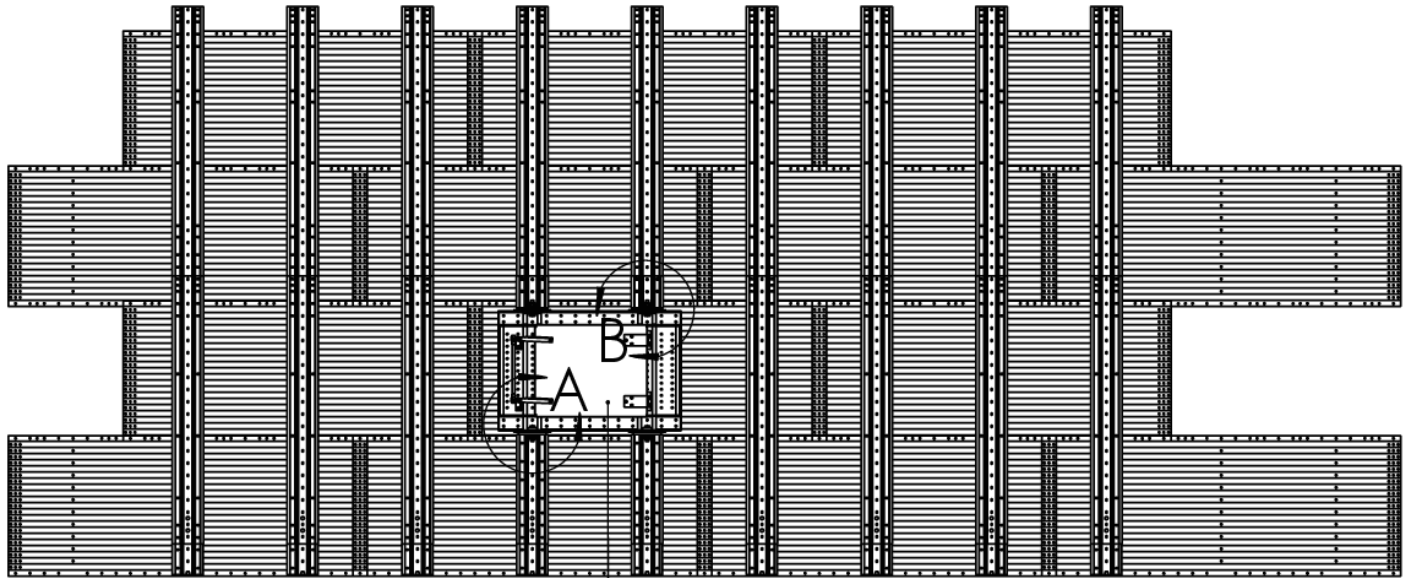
and Table 4 show components of 30" x 60" Code U Walk-Through Door for 72' to 135' dia. bin. Flat cutout sheets (Items 3 & 4) need to be installed on inside of bin first. NOTE: One flat sheet (Item 3) has half-moons welded onto it to match inside corrugations. Attach flat cutout sheets using same hardware as used on sidewall ring to which they are attached. See color chart. NOTE: Leave out outside column of bolts until attachment of corrugated end plates (Item 11).
